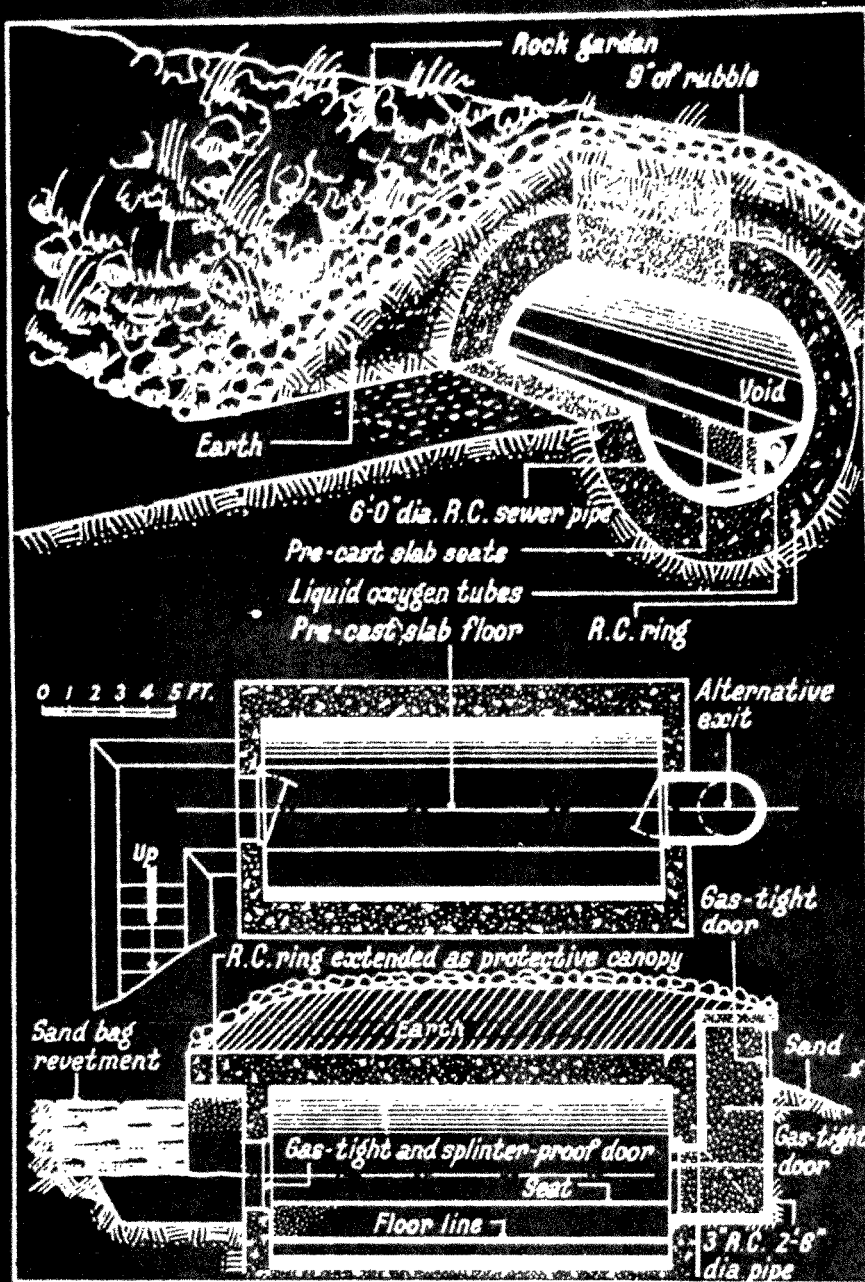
Improved tubular shelter affording a high degree of protection. Note the sand filling of the emergency exit as interior protection of the outlet (always somewhat vulnerable).
